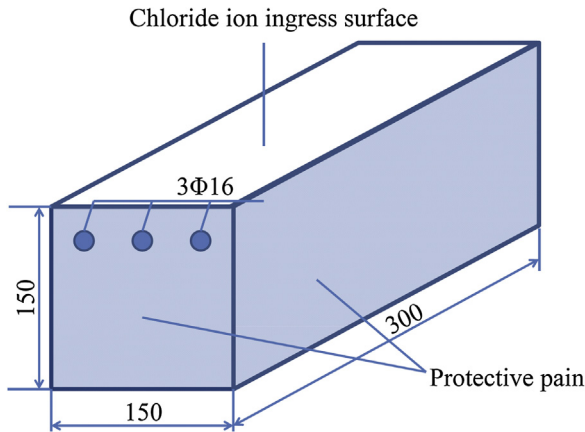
Schematic of the reinforced concrete specimen (dimensions are in mm).
